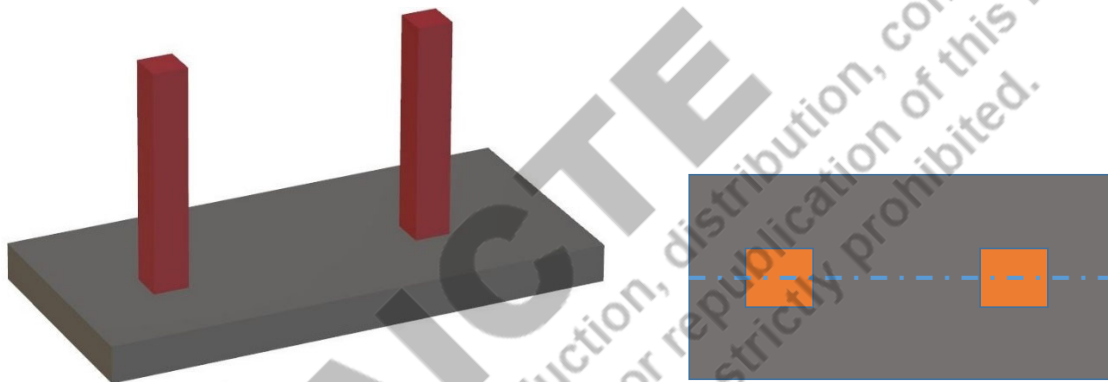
(a). Combined rectangular footing Fig 2.13 (b). Plan of combined rectangular footing
